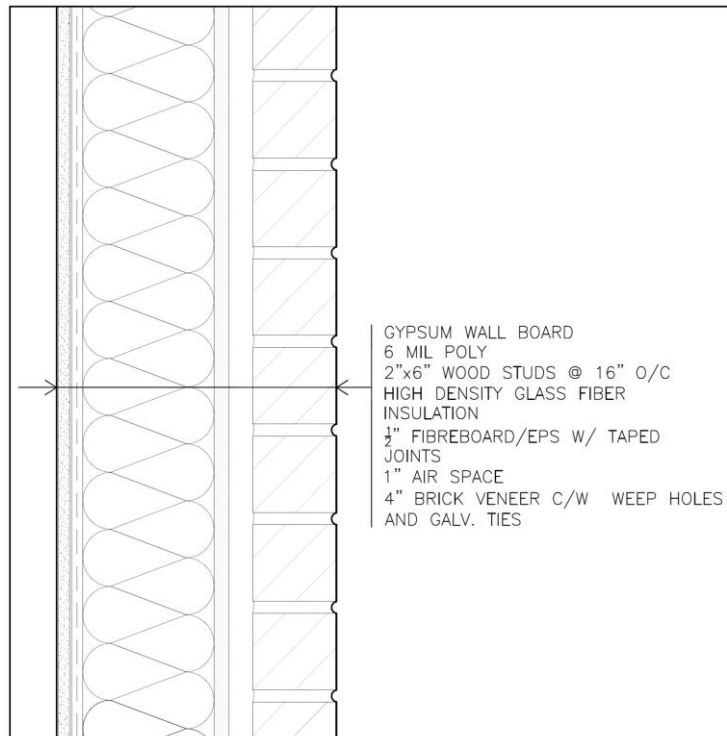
Wall Assembly Cross-Section (Twiddy, 2011)
